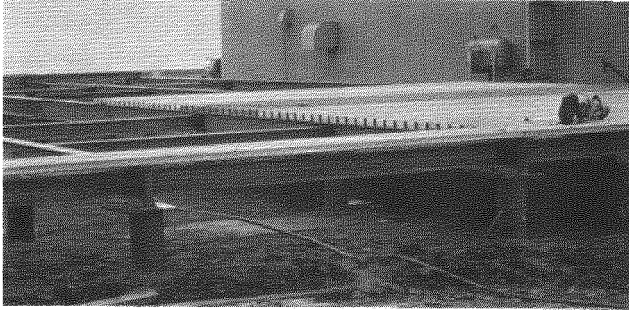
Steel floor beams and a corrugated steel deck were placed on the piles.
